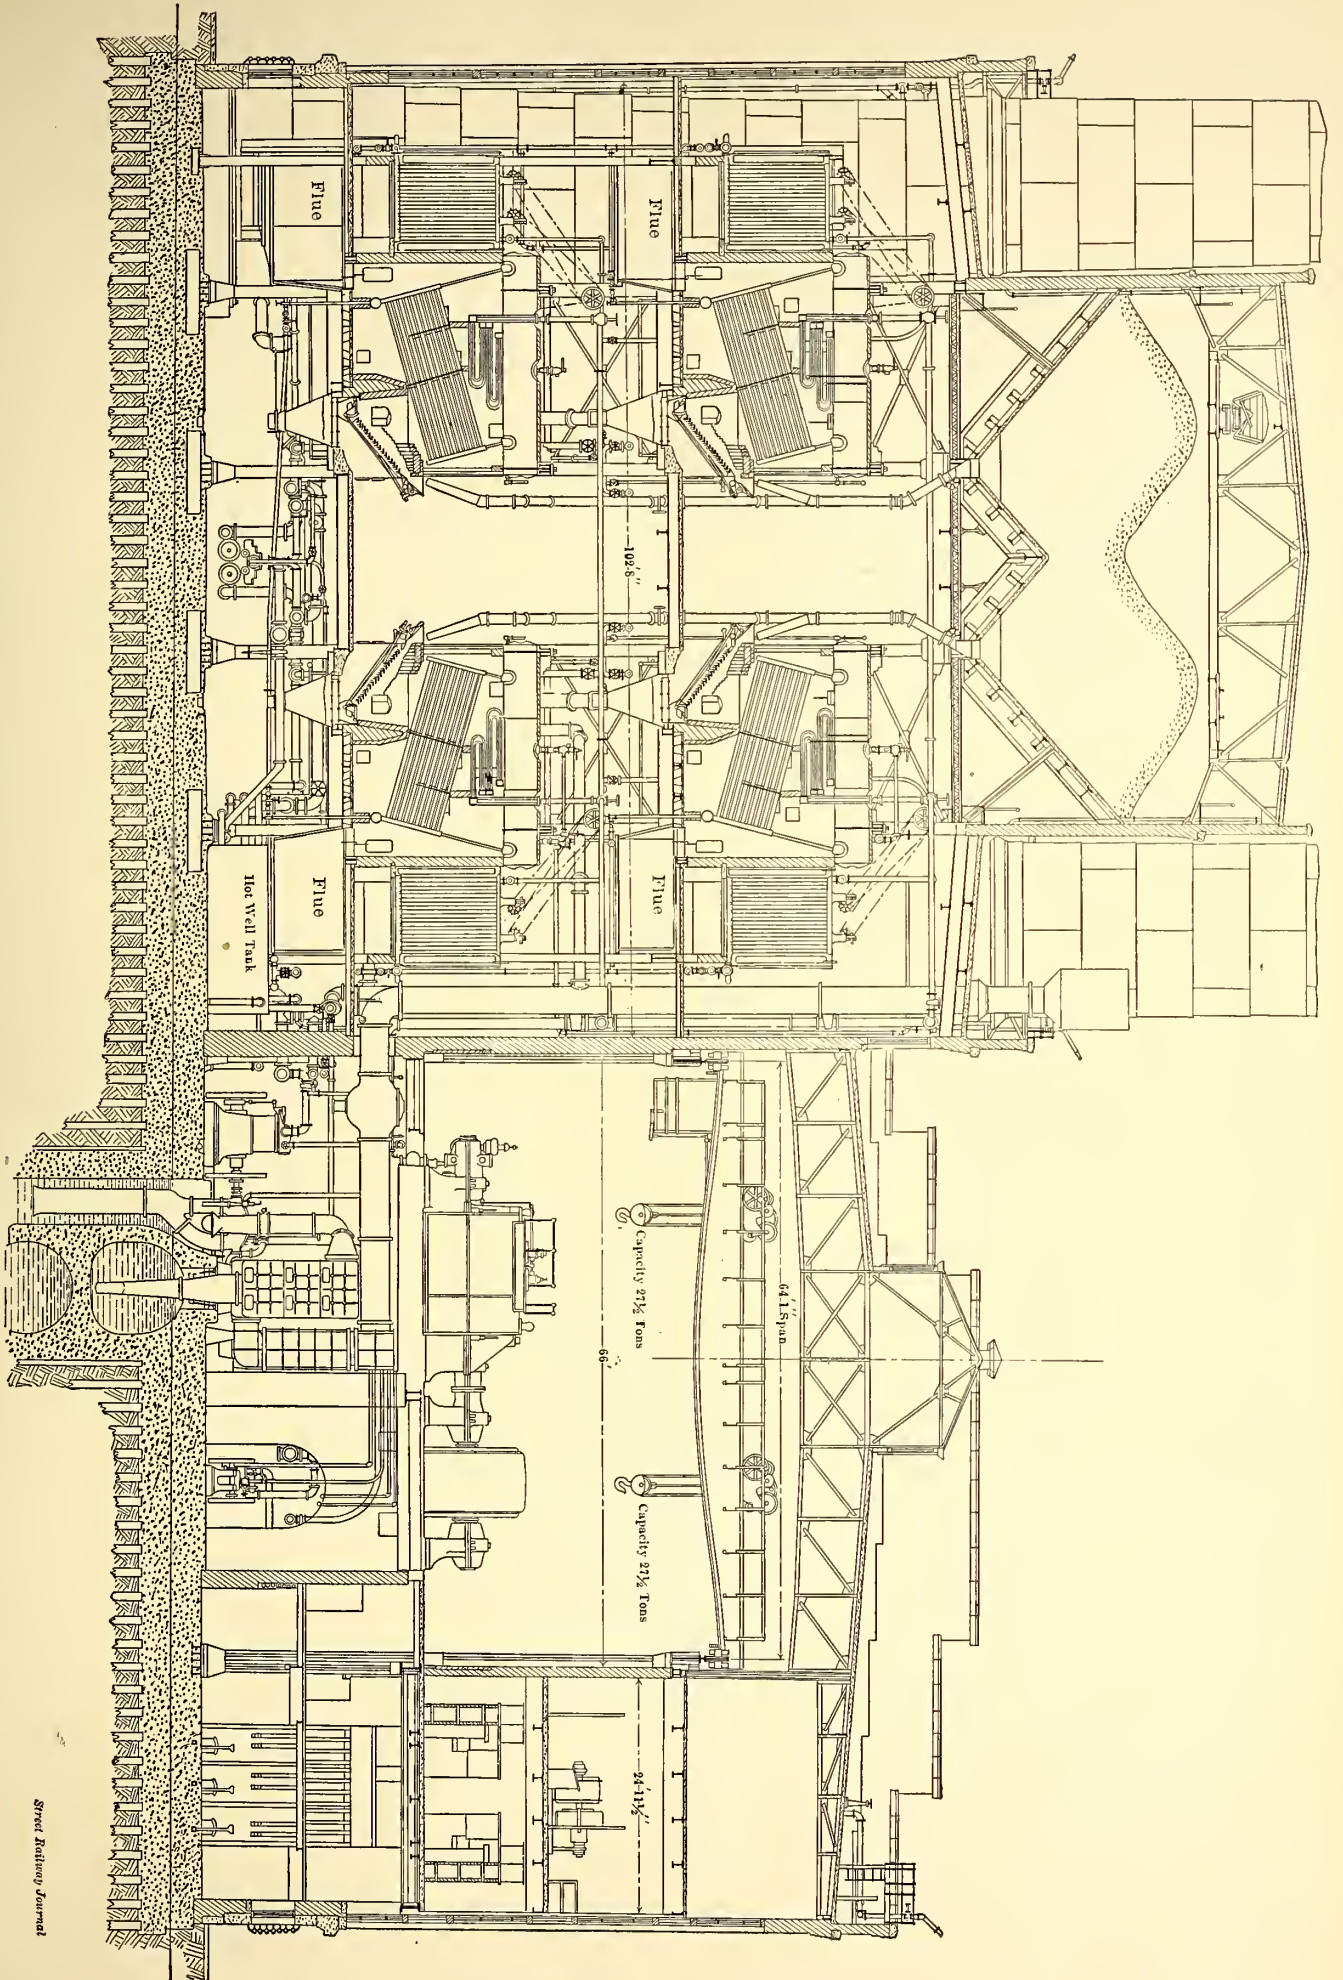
SECTIONAL ELEVATION THROUGH STATION
